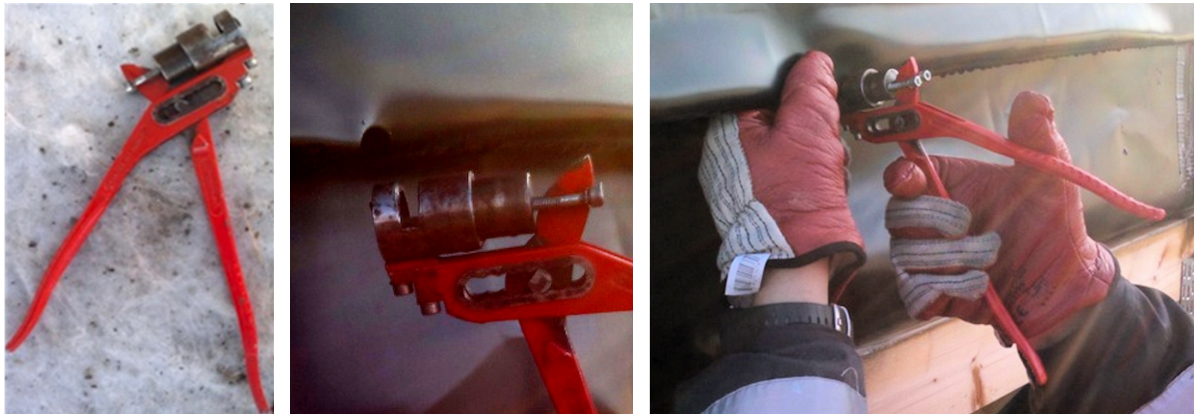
Punching holes in the plastic-welded top-cover edge, using a bespoke cutter.
